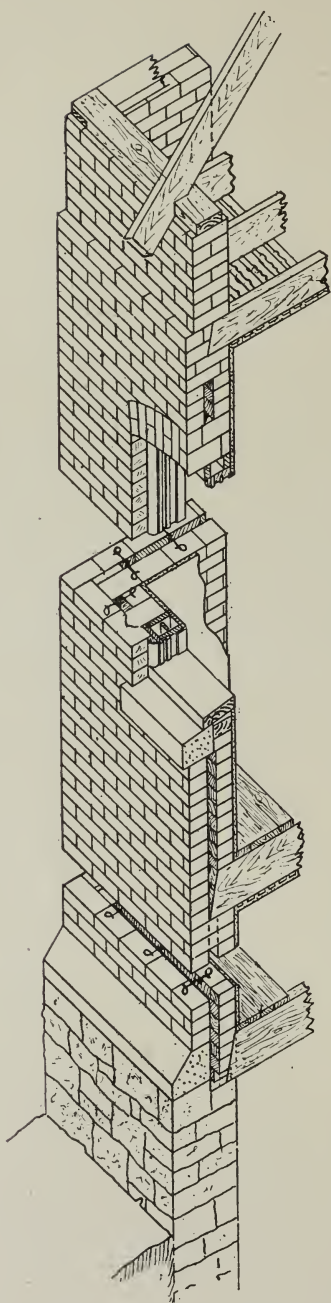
Brick Hollow Walls for Cheap Cottage Construction.
